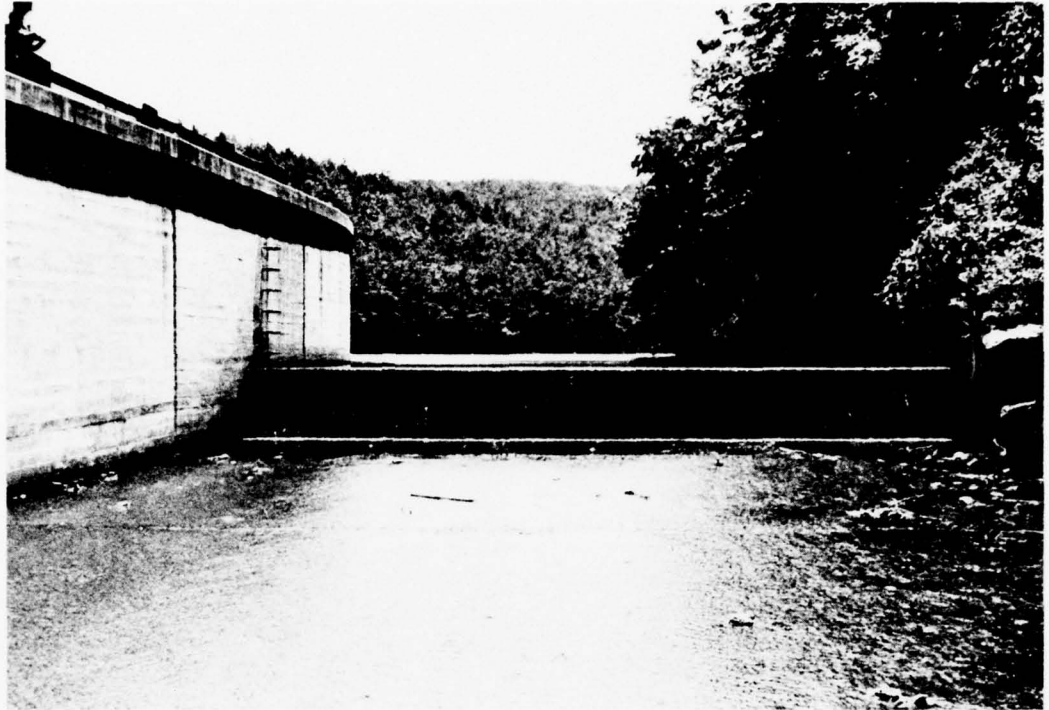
Downstream Slope of Dam With Parking Area Bench
